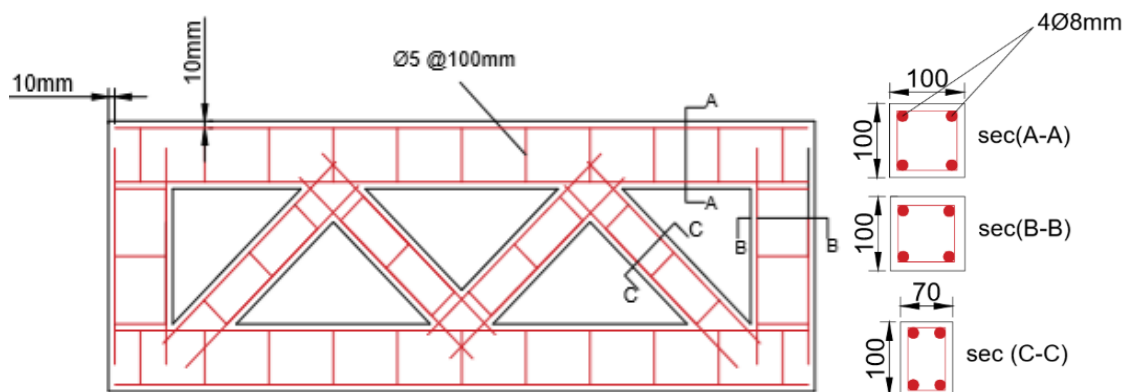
Reinforcement details of coupled beams (all dimensions in mm)
